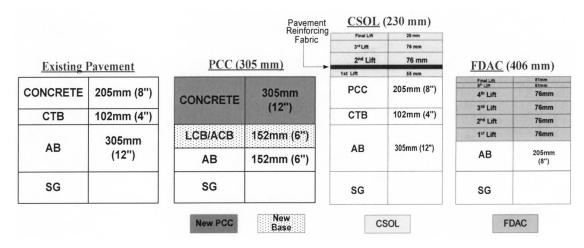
Typical pavement cross-section changes modeled in Construction Analysis for Pavement Rehabilitation Strategies
